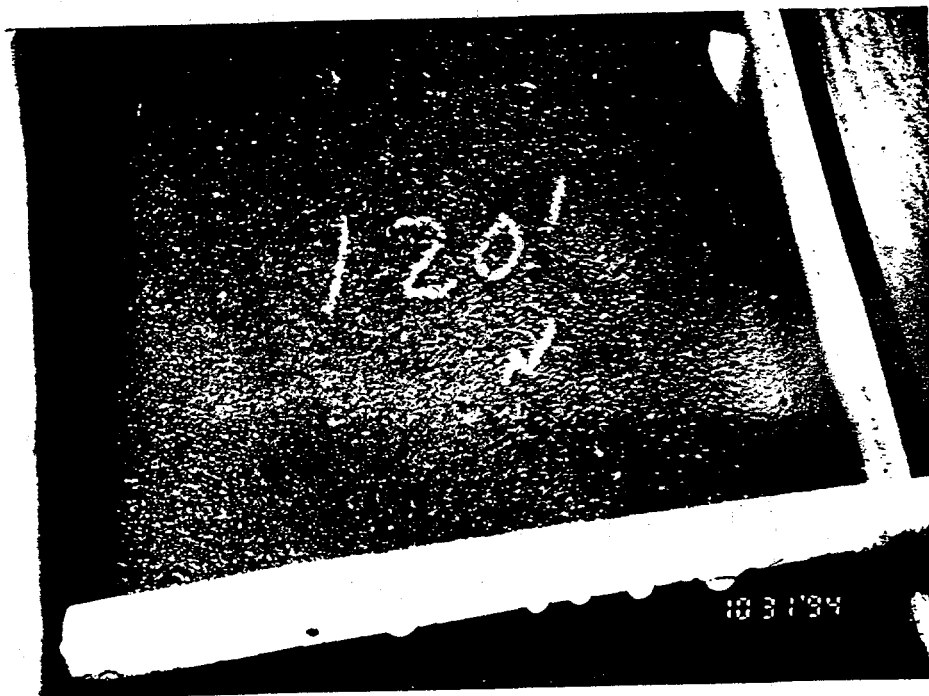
120' elevation, north quadrant, the concrete is solid and sound.
